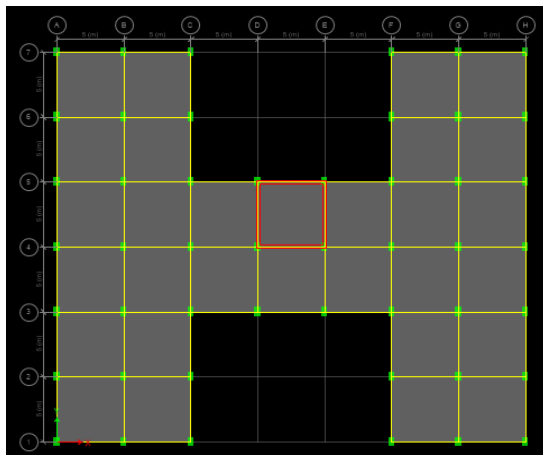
Plan view shear wall building with staggered openings Fig 4 3D view shear wall building with staggered openings
